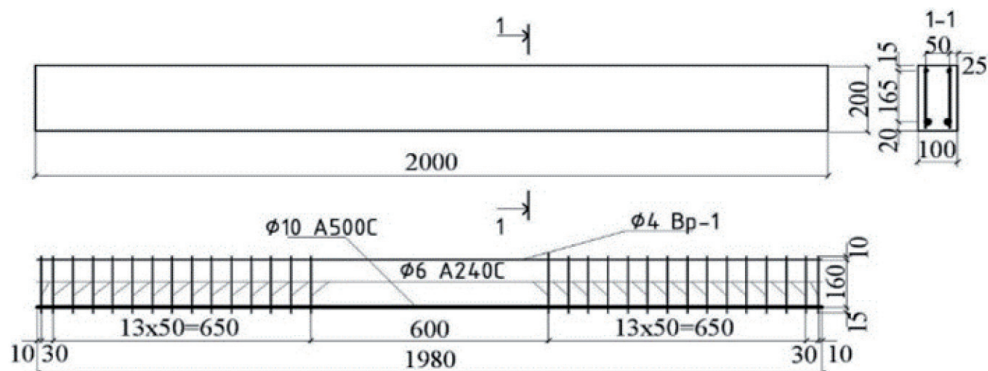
Structural scheme of non-strengthened analyzing beams
